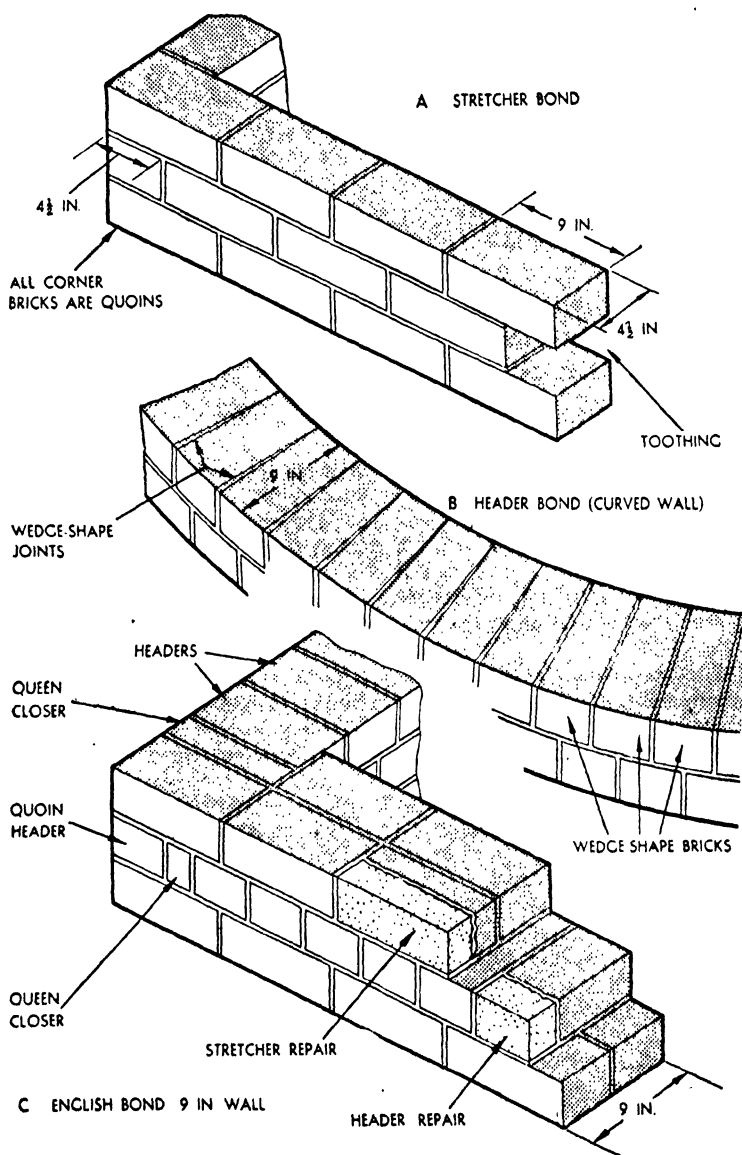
Common bonds employed in wall construction. A. Stretcher bond; B. Header bond; C. English bond. Stretcher bond is used in $4\frac{1}{2}$ -in. walls, but is not used in walls of greater thickness as it does not provide a transverse bond. Header bond is used for curved walls and foundation footings. In English bond there are alternate courses of headers and stretchers.
